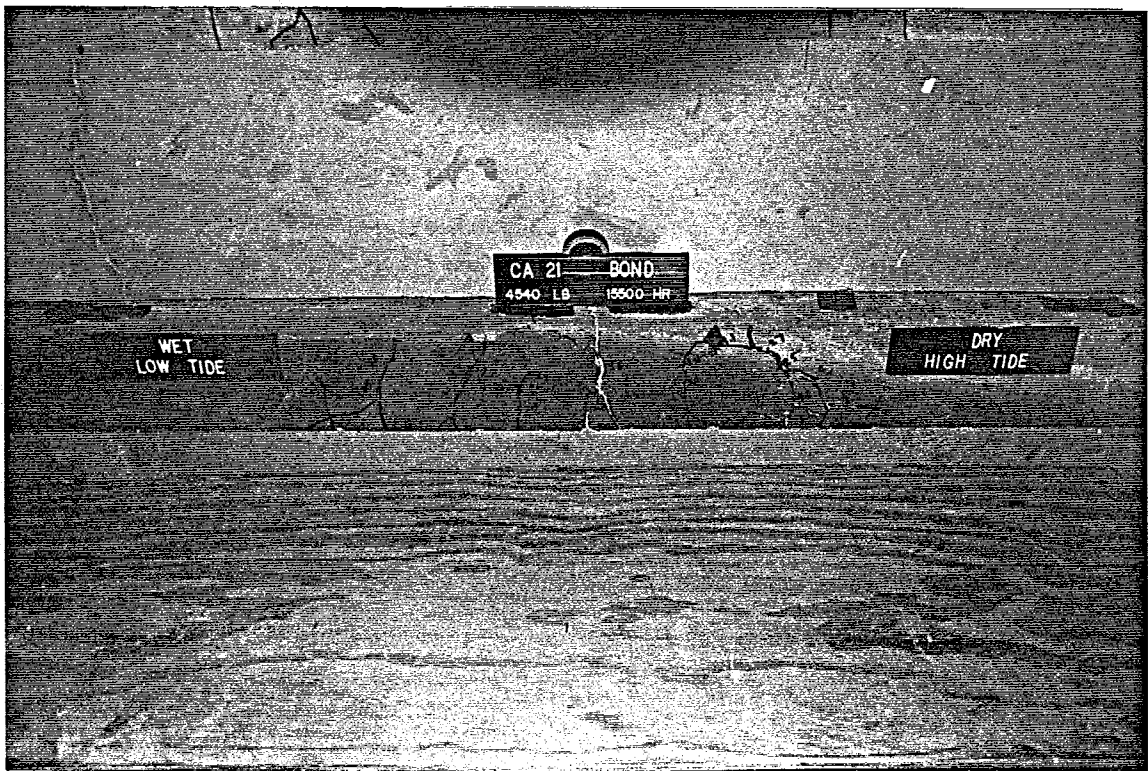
Crack Pattern for Beam CA 21 - Tested After 15,500 Hours
